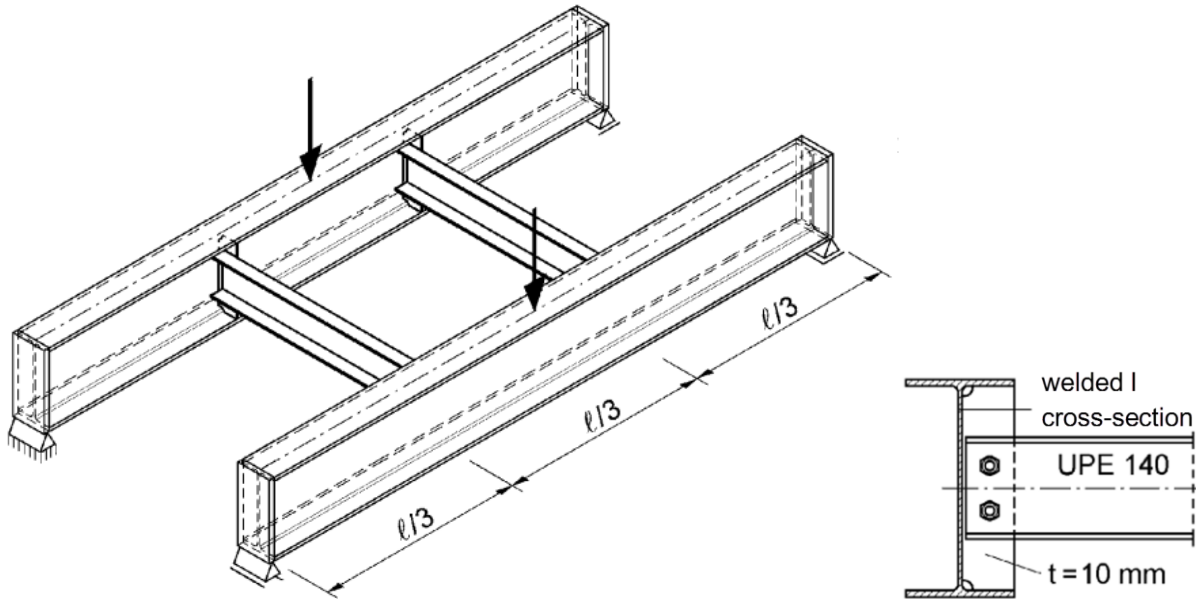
Girders with stiffening beams and connection detail (source: [2])
